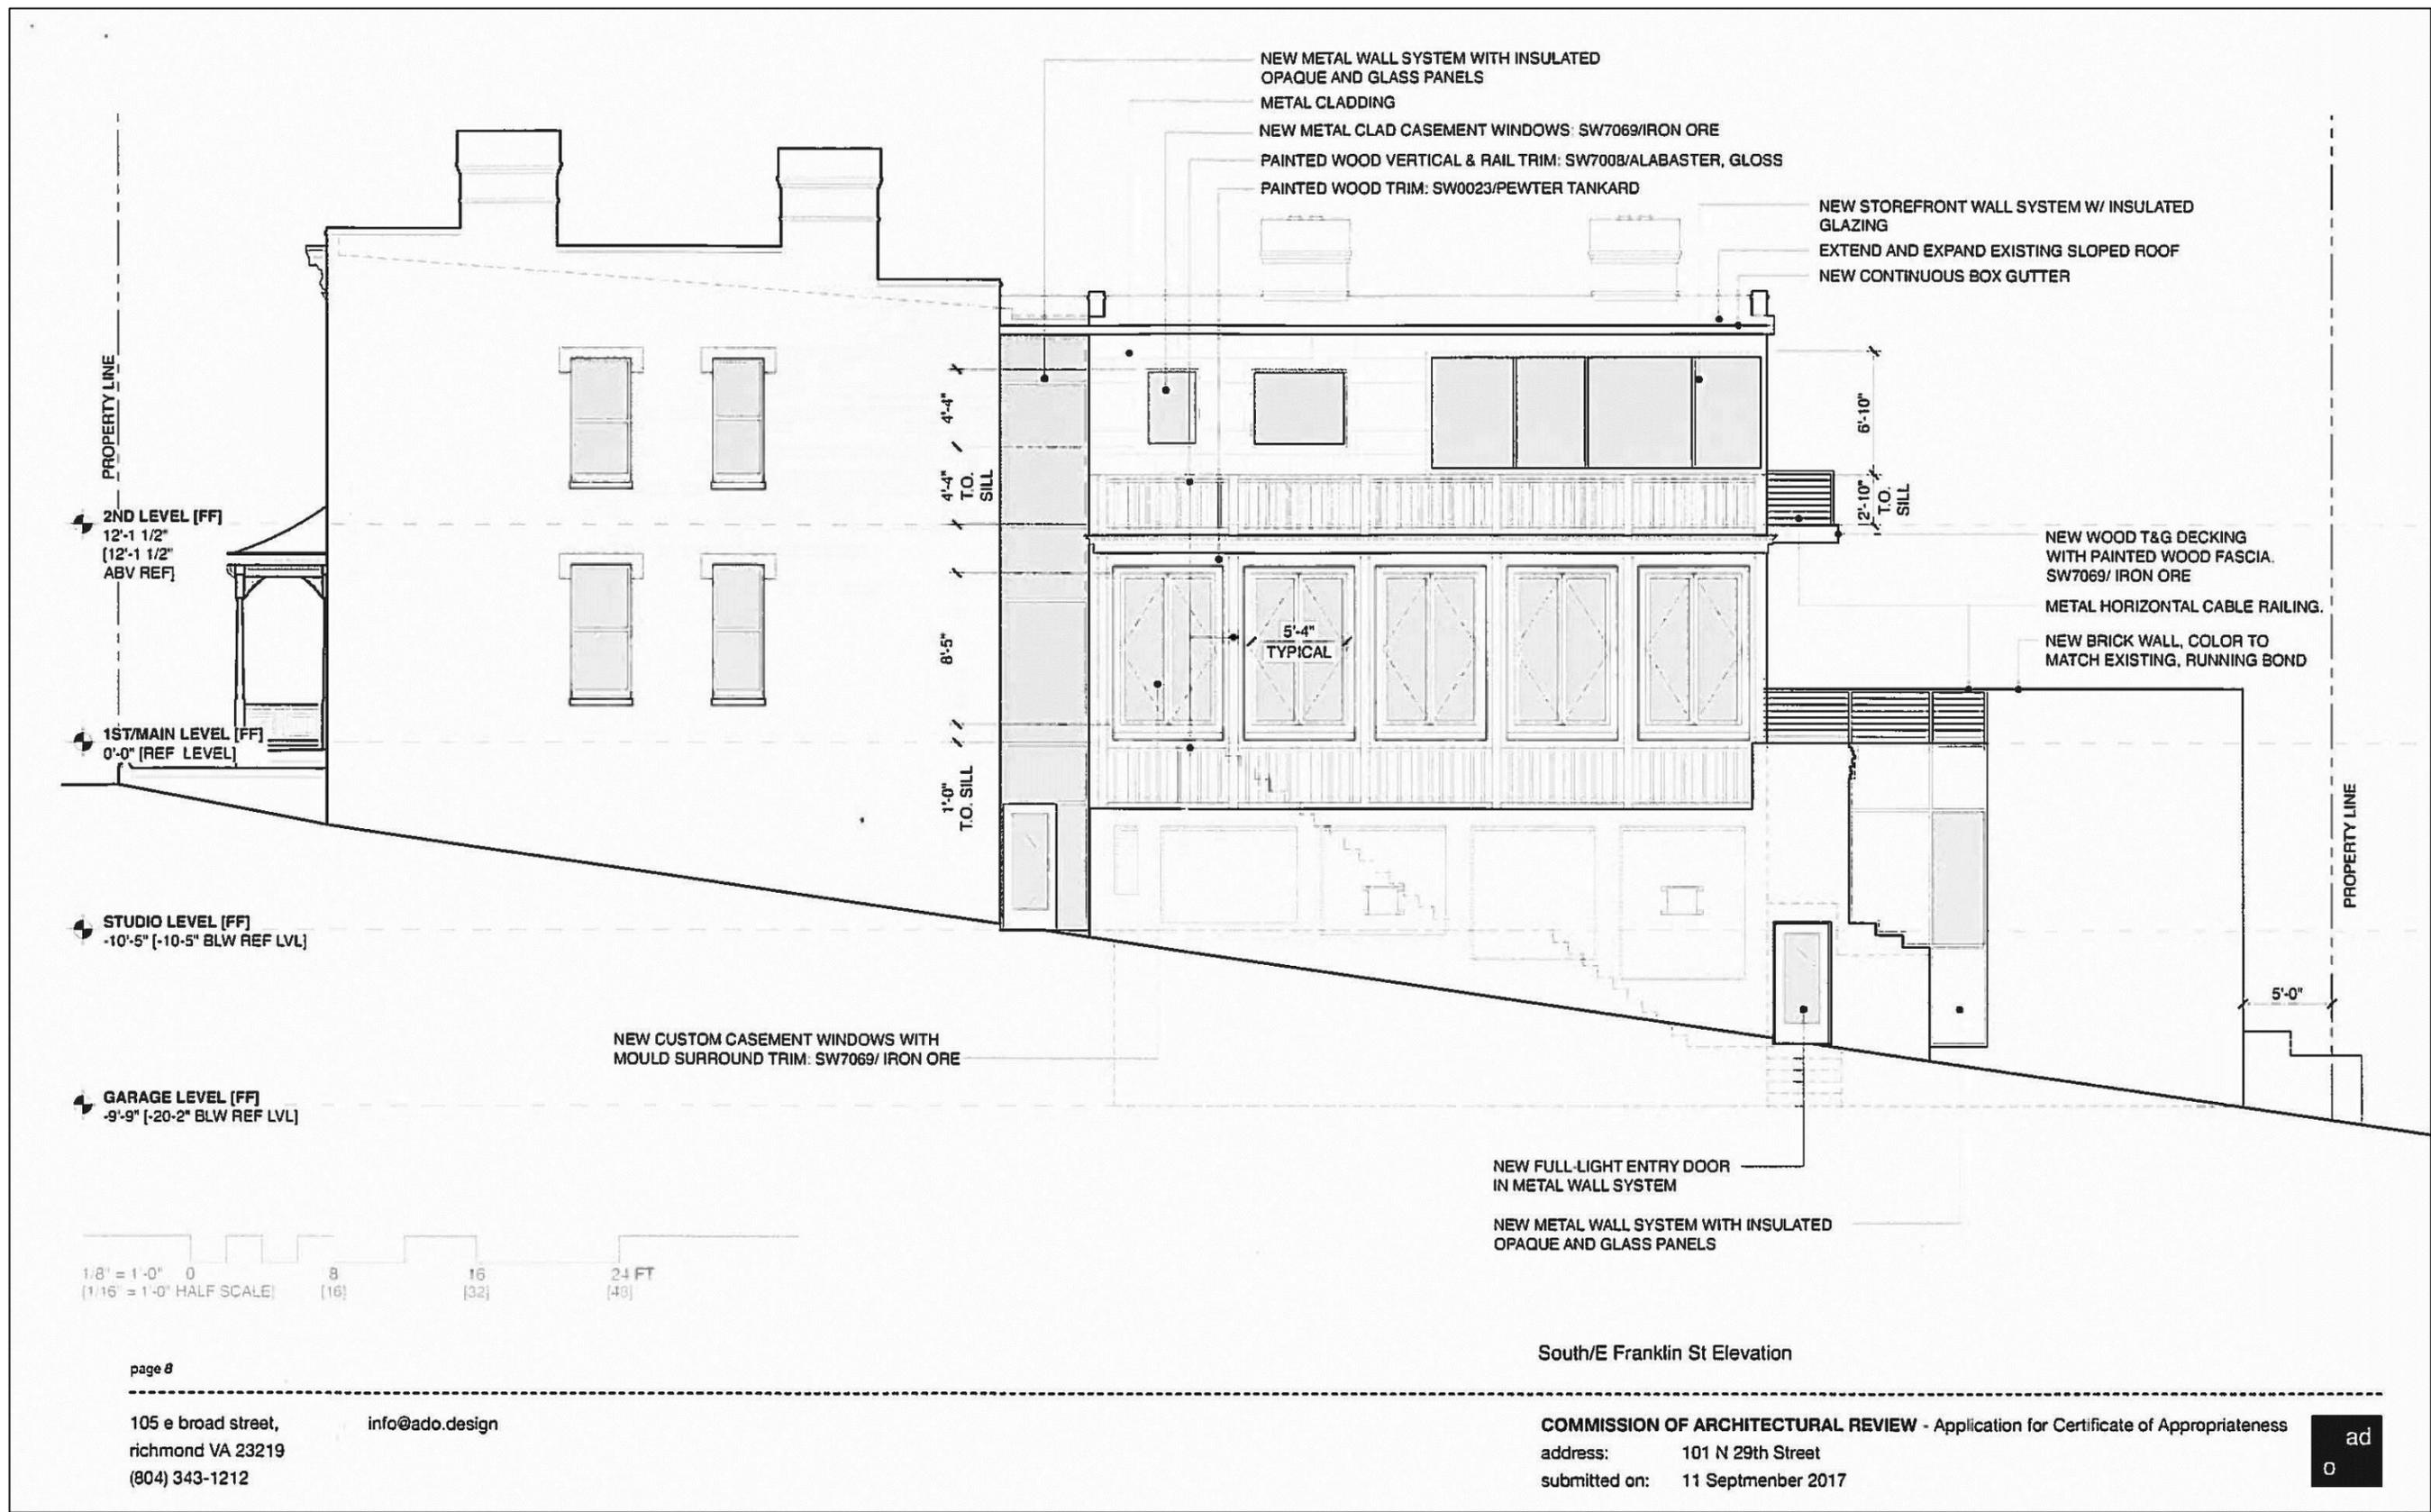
Previously approved elevation with faux railing on the second story, original connector between house and porch enclosure, and garage elevation. The rear elevation second story porch and the partial brick parapet wall on the garage were not approved.
